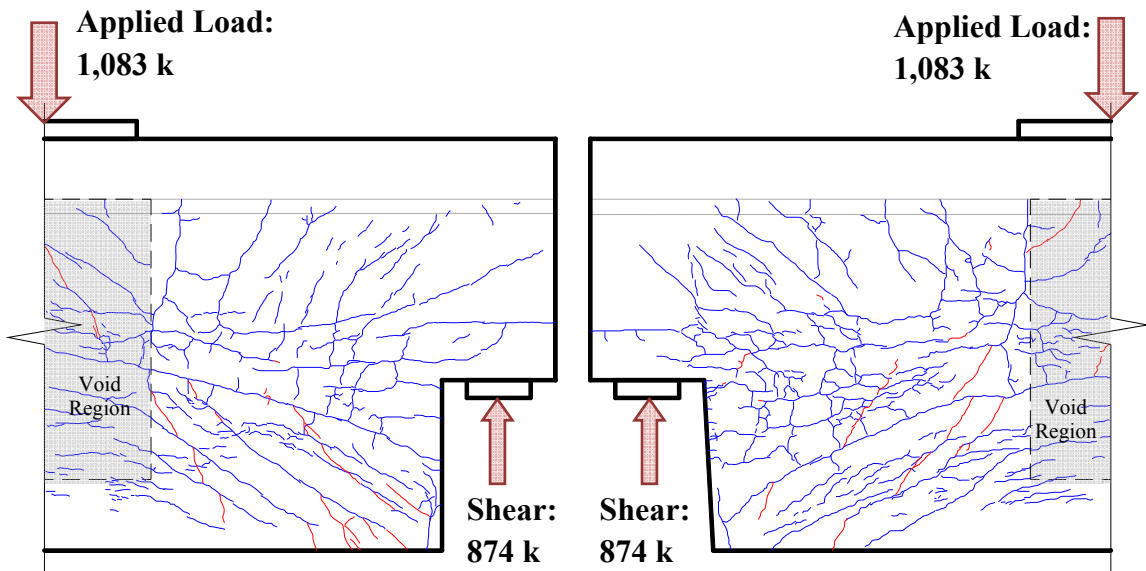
Cracking in beam on the east (left) and west (right) sides of the beam prior to failure.
